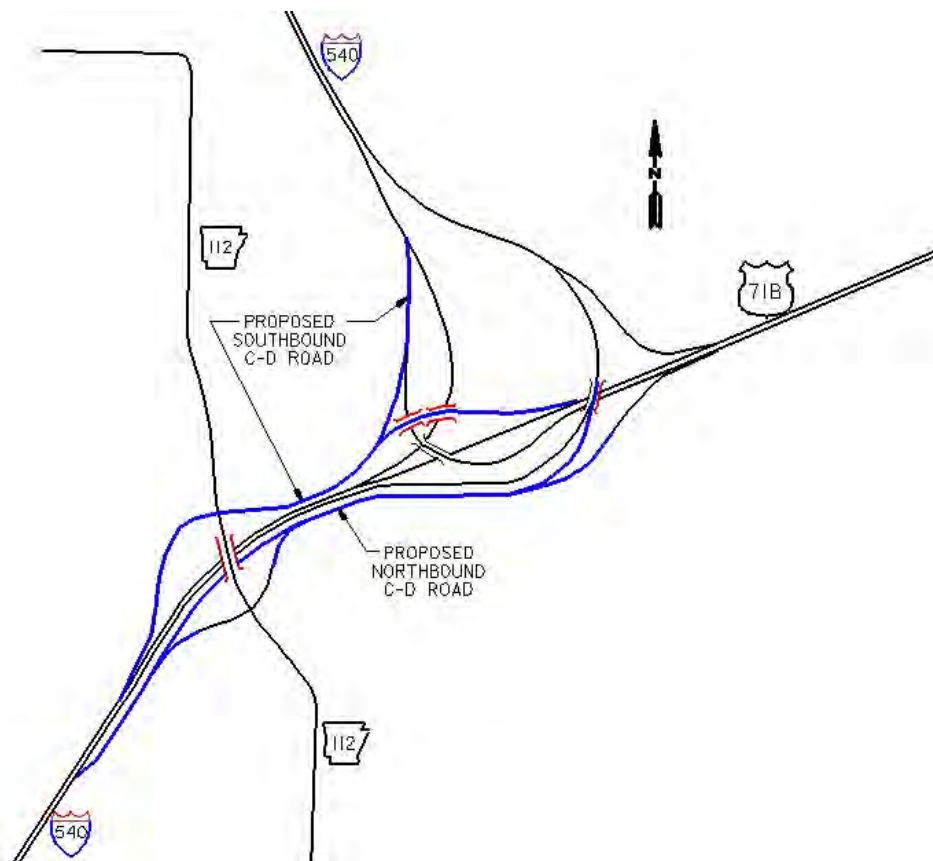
/ 67-2 — Proposed Configuration of Exits 66 and 67
